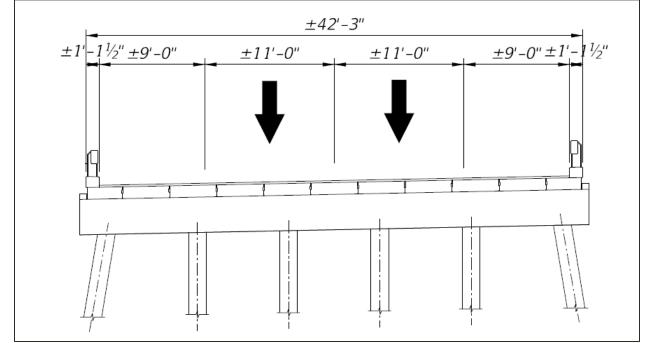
Existing Bridge Typical Section (Bridge No. 120025)
